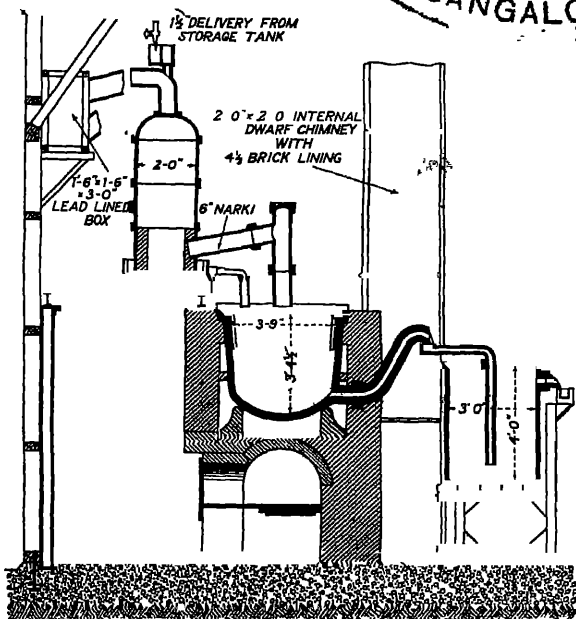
GENERAL ARRANGEMENT OF A DREYFUS PLANT.
